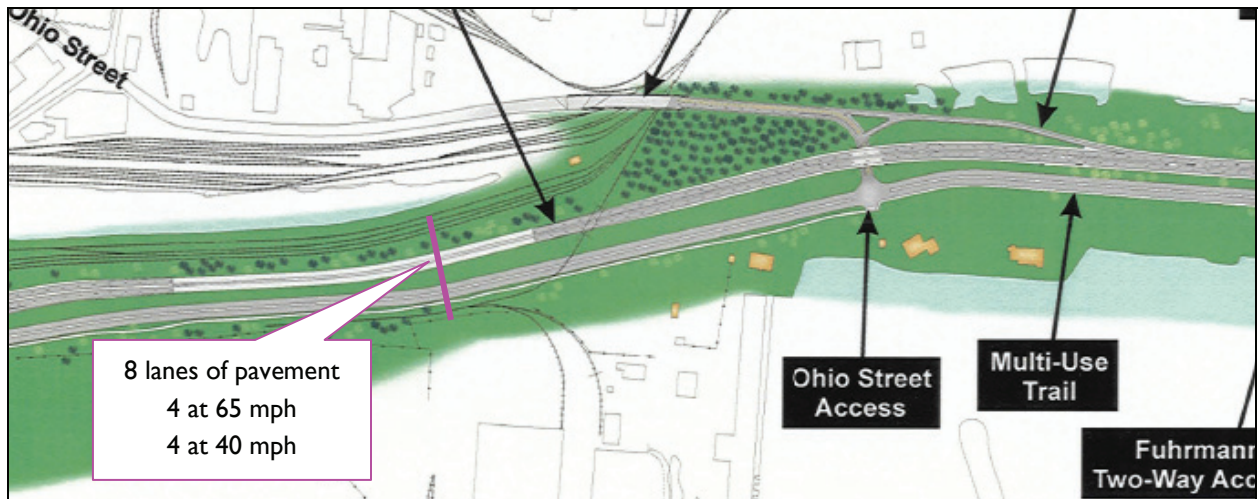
NYSDOT Boulevard Alternative at Ohio Street
